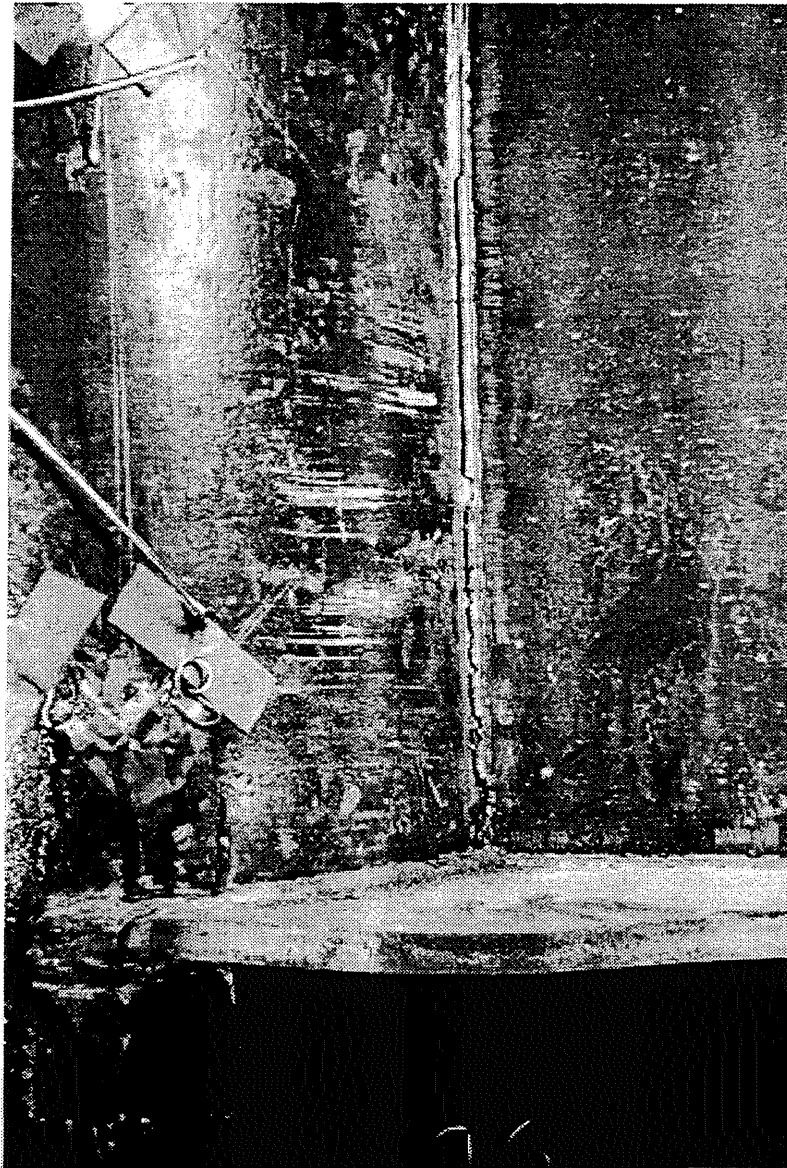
b. Failure of Connection *Type I*: Weld and Flange Fracture
